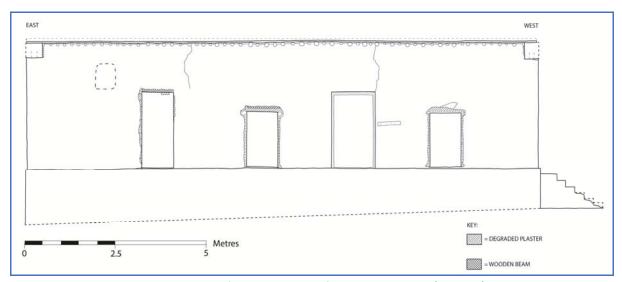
North facing elevation of *Majlis* Structure 2 (Internal).
